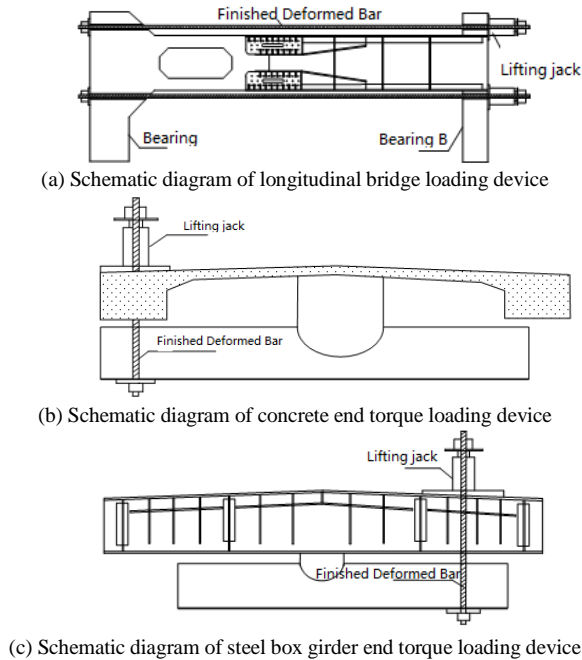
Steel - concrete composite section loading schematic diagram (initially proposed)
